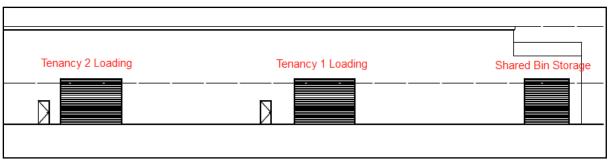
proposed rear elevation detail (eastern end). Neutral colour to be applied to façade as per frontage.
